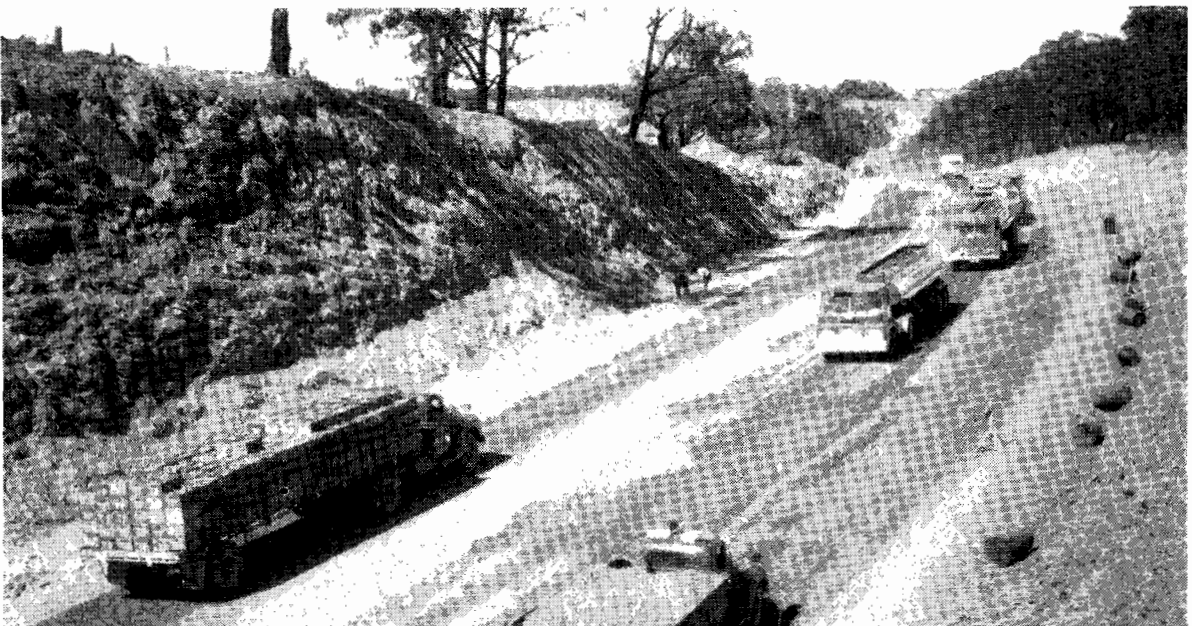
Hume Highway, Section 1, 39 miles. New alignment and cutting in course of construction at Green's Pinch. 9202/60.—3
